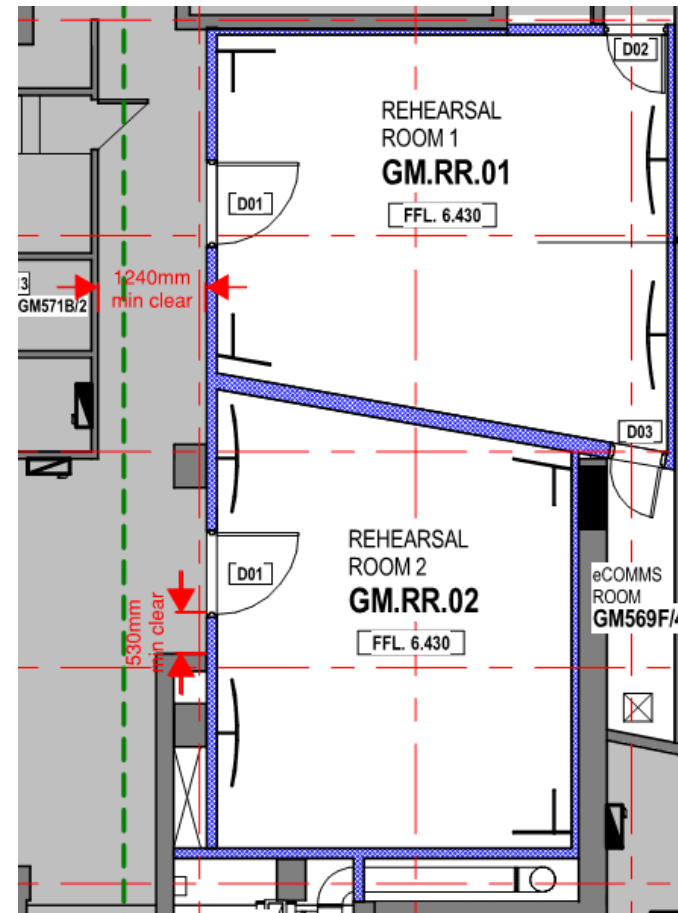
Extract from the plan indicating minimum clearances to be achieved.
